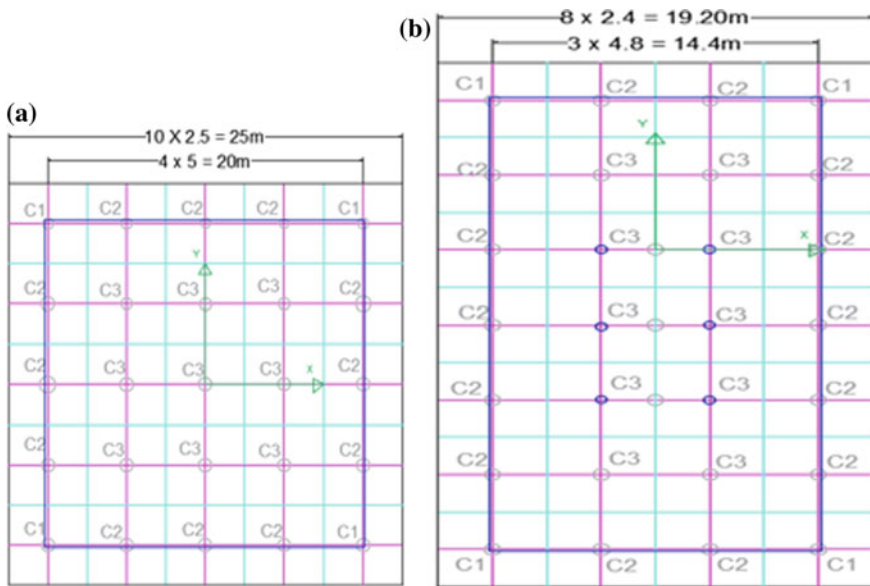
Floor and raft plan. a Square structure, b rectangular structure
